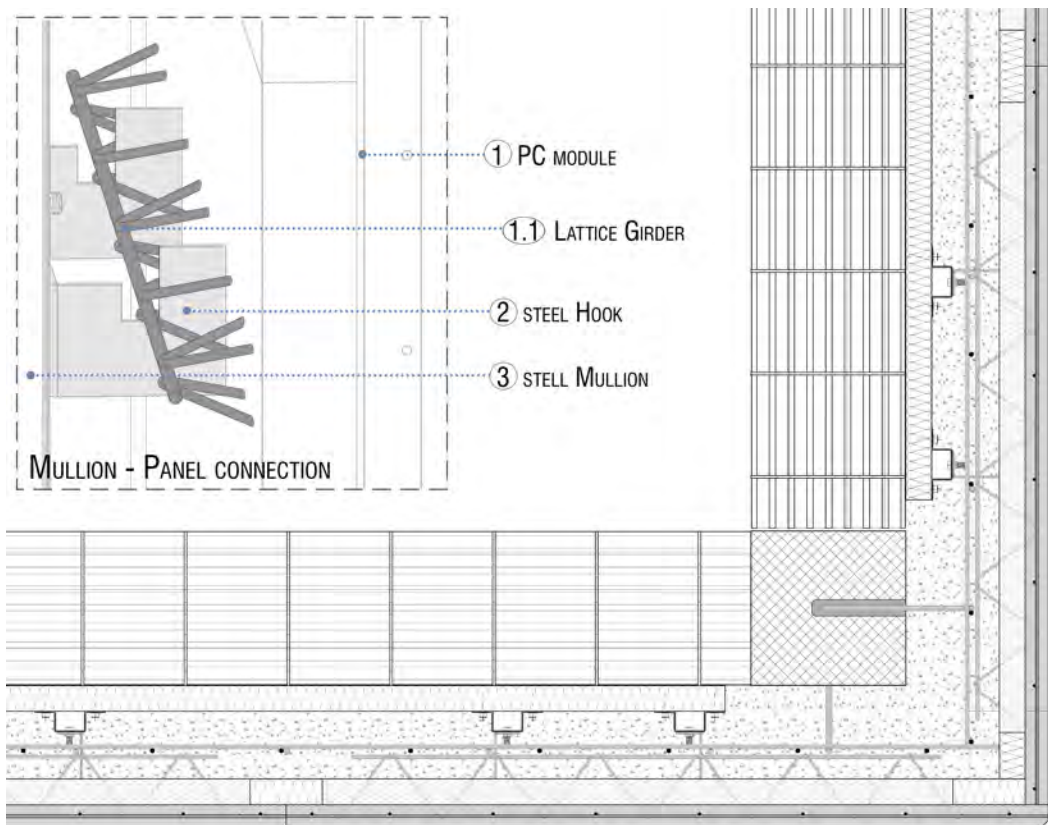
Corner section and focus on the mullion-panel connection. Source: Author
